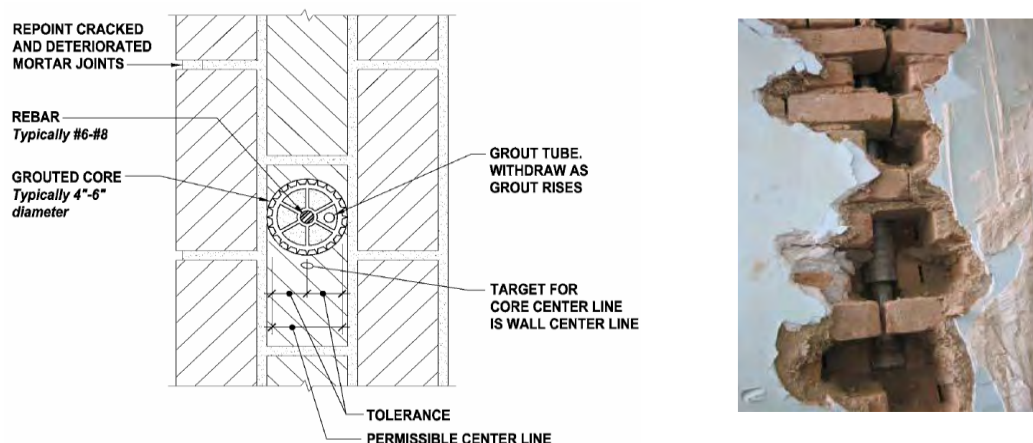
Left: Plan Detail of Center Core method in Masonry Wall Right: Applying Center Core method for existing building.
